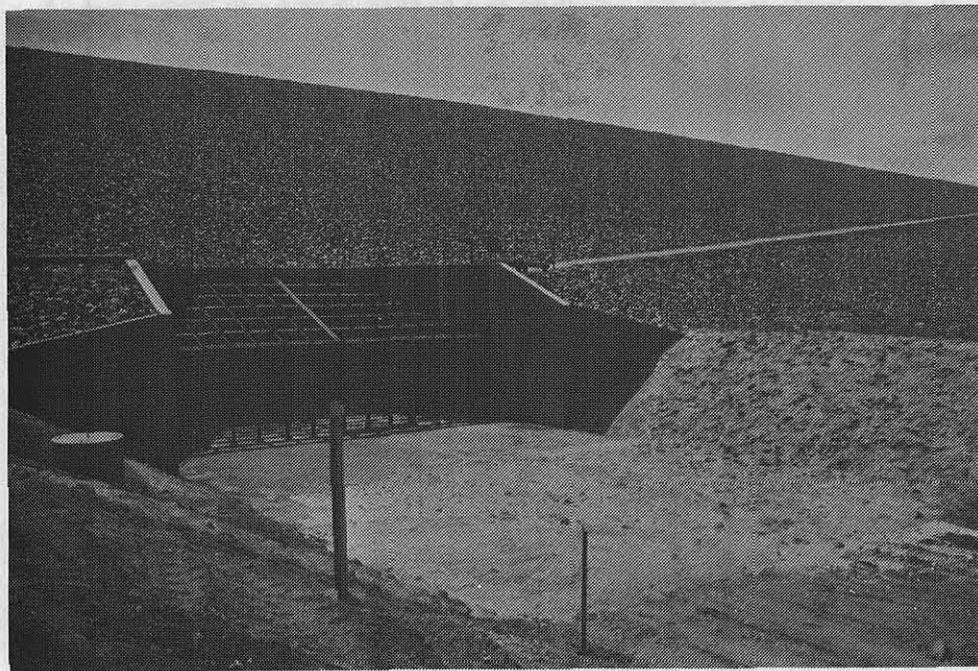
Intake structure and trash rack. Note grouted stone section of approach channel. April 1985
